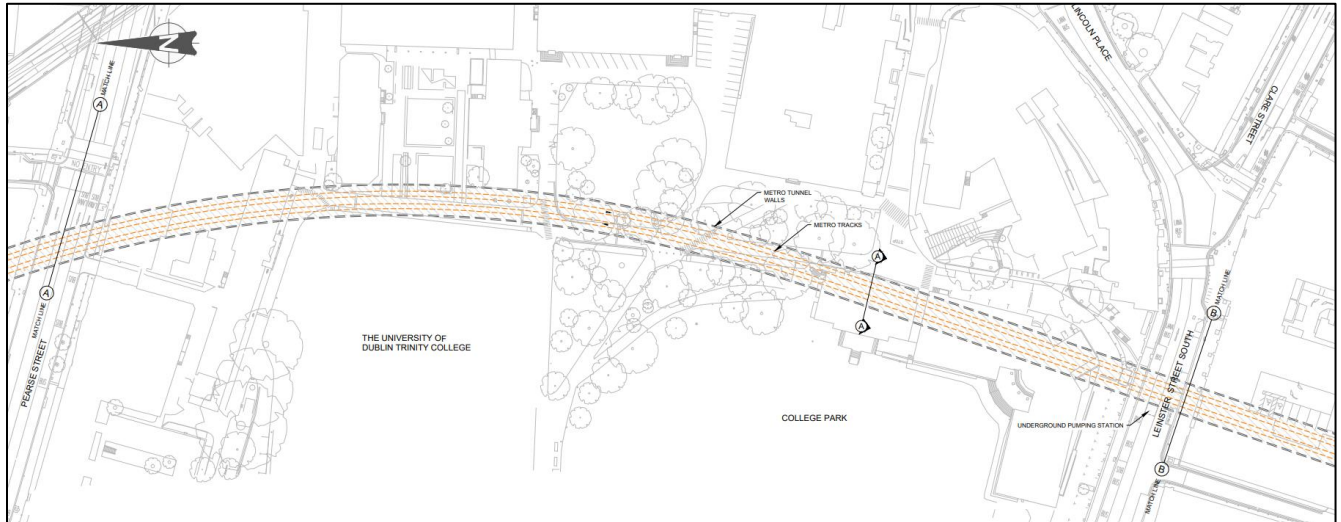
Horizontal Alignment Showing Proposed Pumping Station
